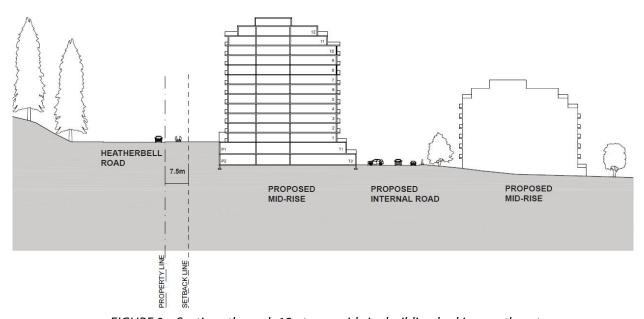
Sections through 12-storey mid-rise building looking northeast
